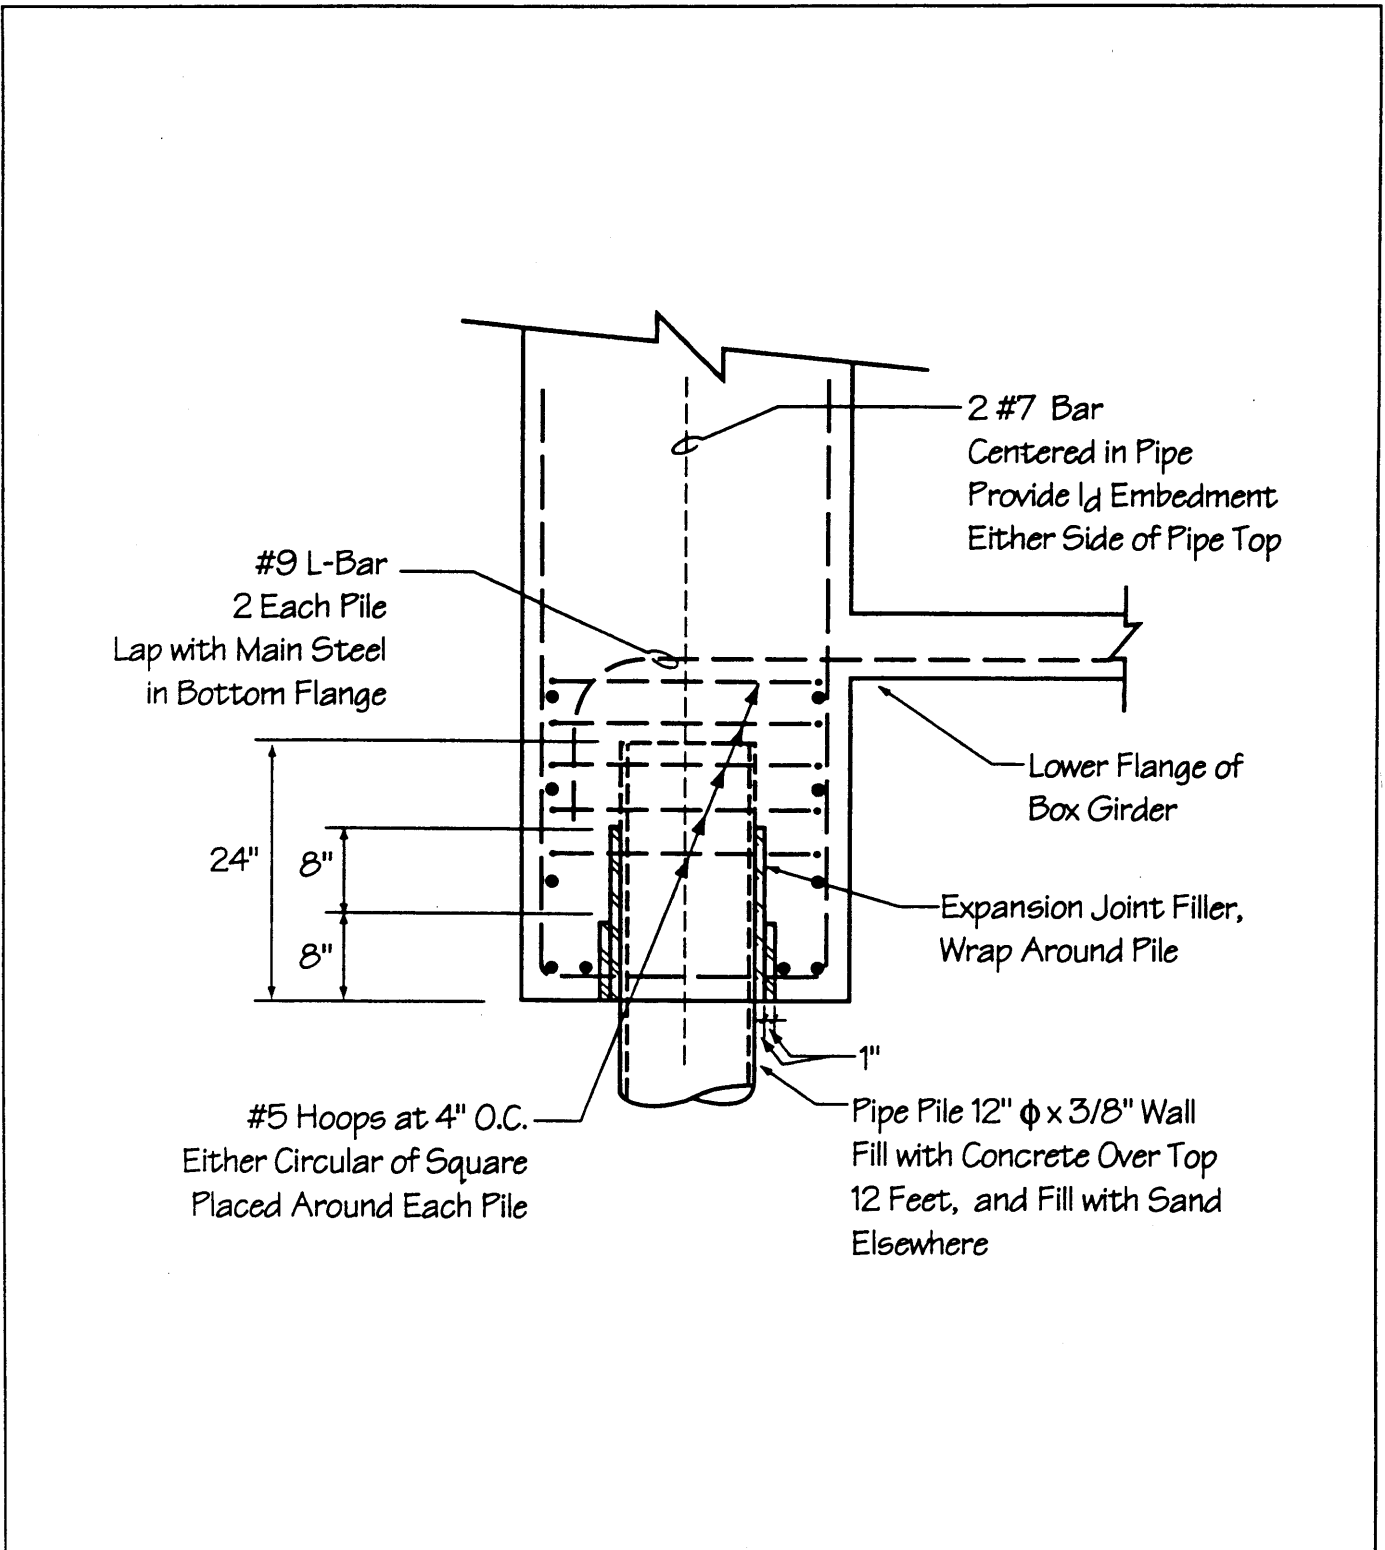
Pipe Pile to End Diaphragm Connection Alternate Details
